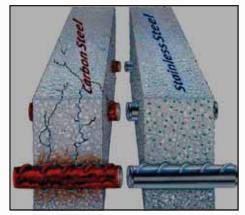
Cracking and spalling of concrete due to rebar corrosion
